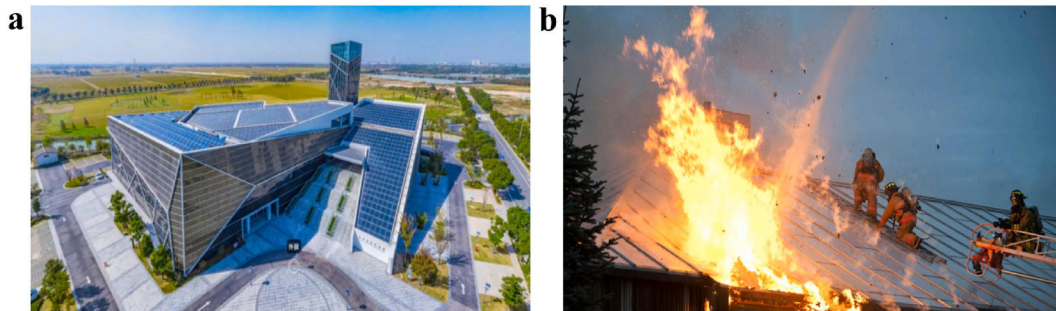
(a) Photovoltaic curtain wall and roof in China [38]; (b) A photovoltaic fire at the inclined building roof [39].
